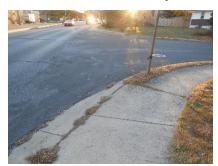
Existing Pedestrian Ramp - SW Corner of Odenton Road Intersection
